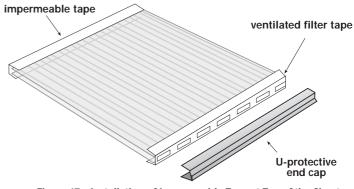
Installation of Impermeable Tape at Top of the Sheet and Installation of Ventilated Tape at the Bottom of the Sheet
